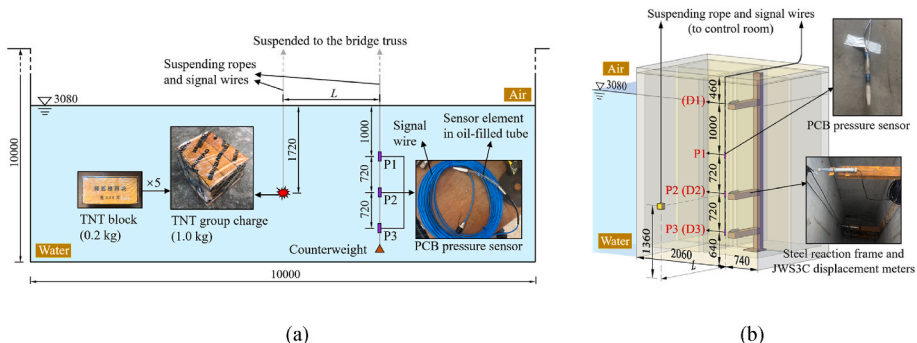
Layout of test instruments (a) in free field (b) on caisson specimen (unit: mm).
